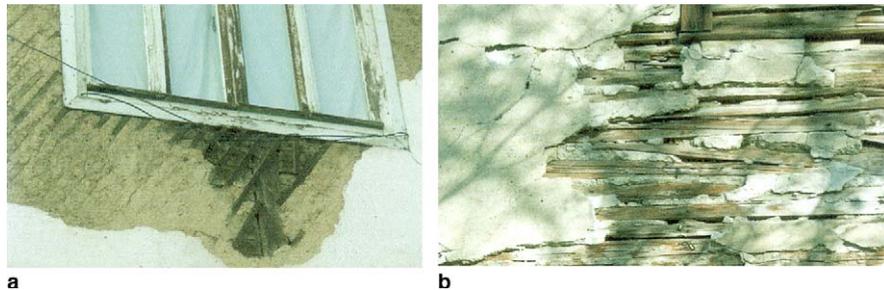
Dizeme construction with laths nailed to the framing elements and covered with mud plaster. (a) Inclined laths nailed to the framing elements and covered with mud plaster. (b) Horizontally placed laths nailed to the framing elements and covered with lime plaster.
